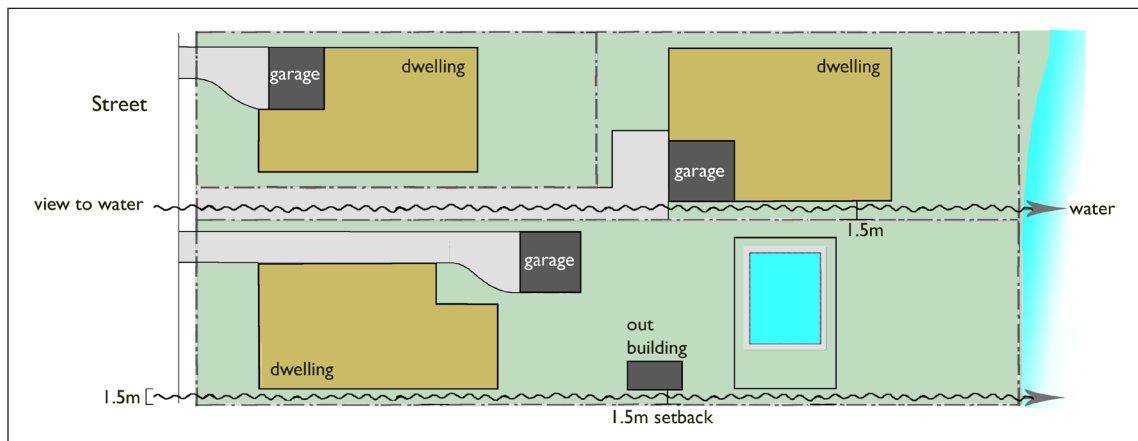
Views from public places to the water are to be provided between buildings along side boundaries. Fencing, landscaping elements, garages and outbuildings are not to obstruct the view.
